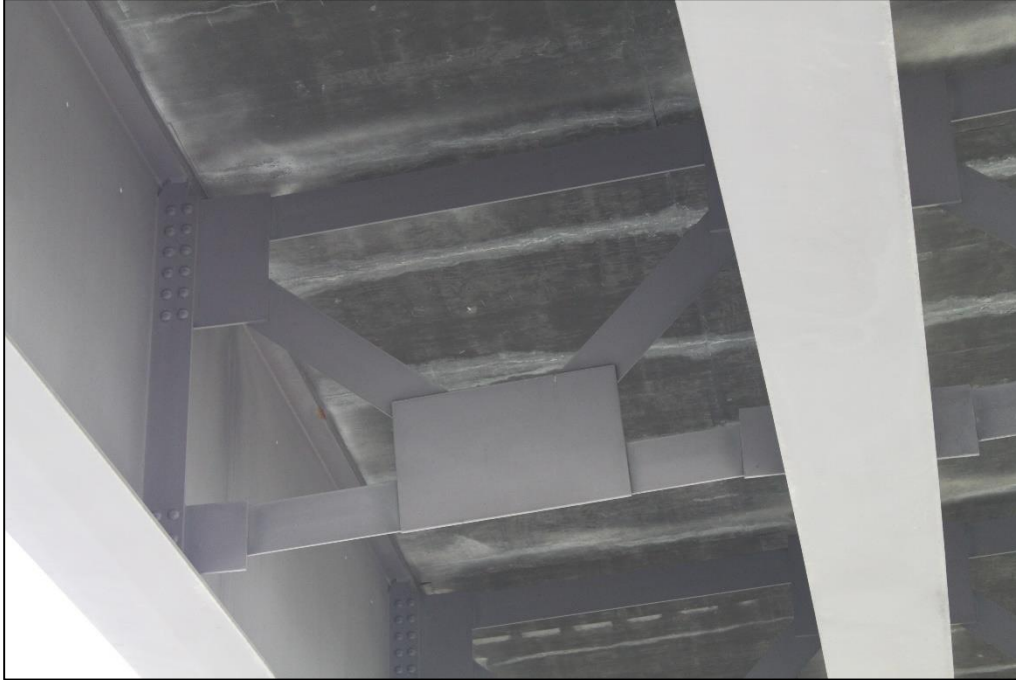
Section of steel girder used in the curved bridge (see Table A.2 for details)
